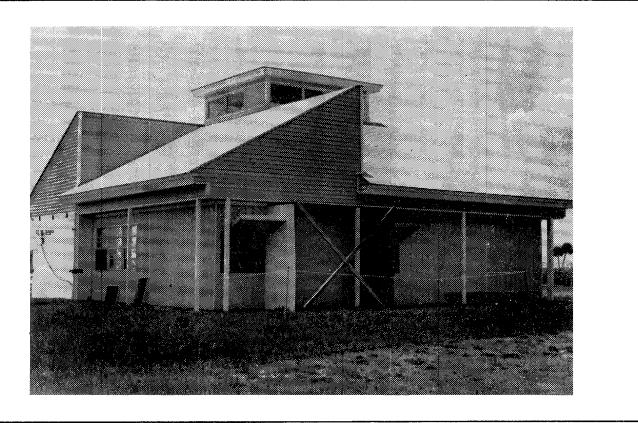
Southeast View of PCL Showing Wing Walls and Overhang Over the Two Windows in the East Wall
